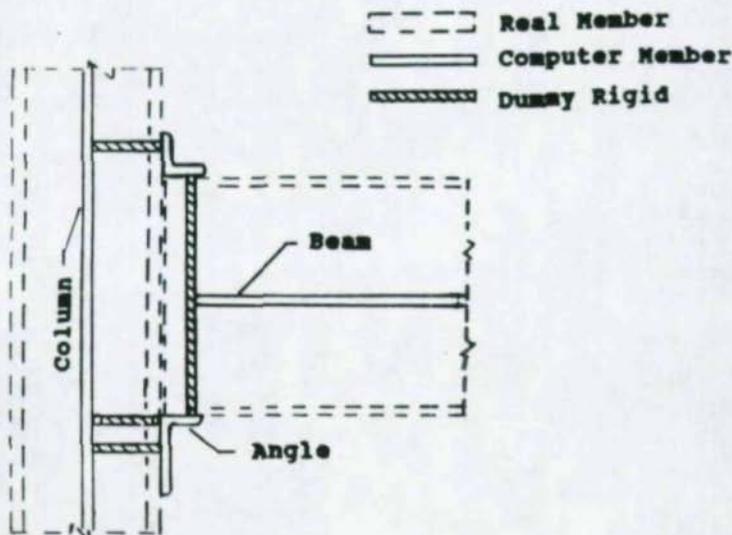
Dummy Rigid Members Space Connection Details for Proper Equilibrium
